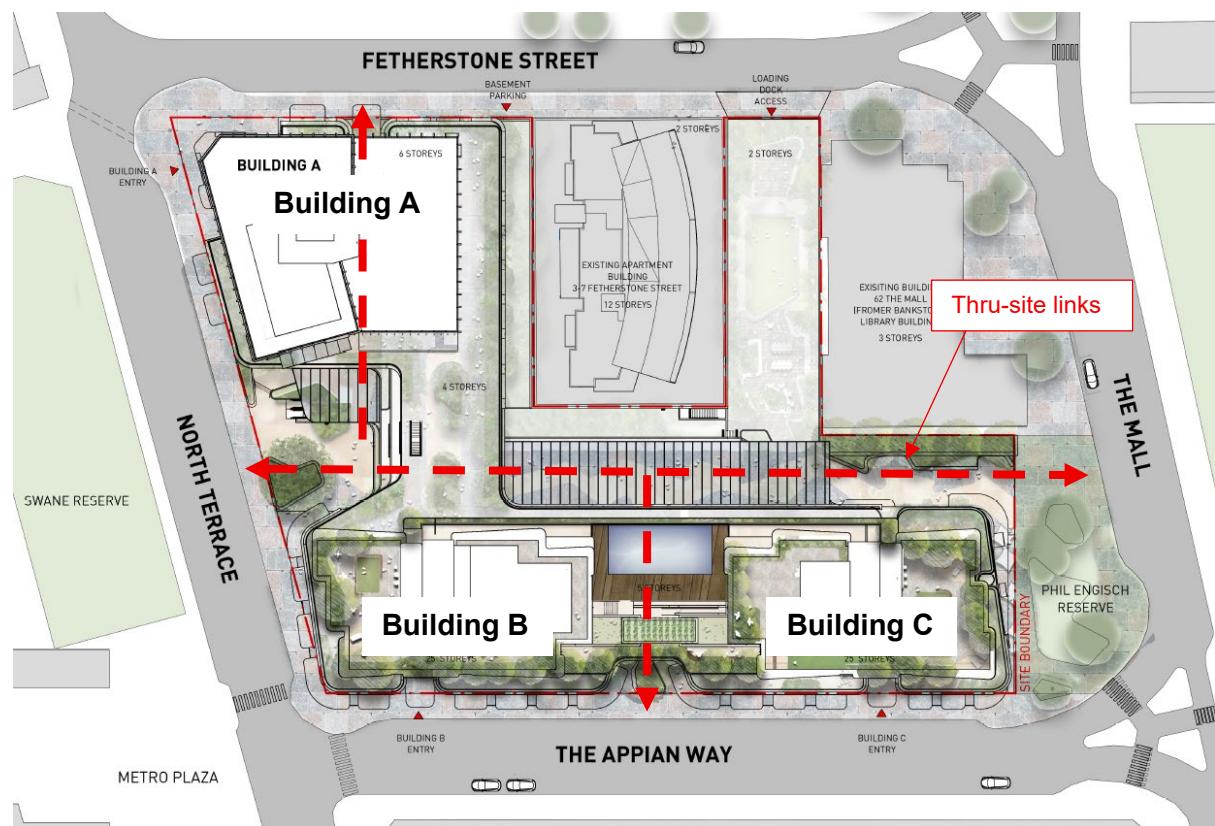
Site Plan (Source: PTW Architects and SJB Planning)
